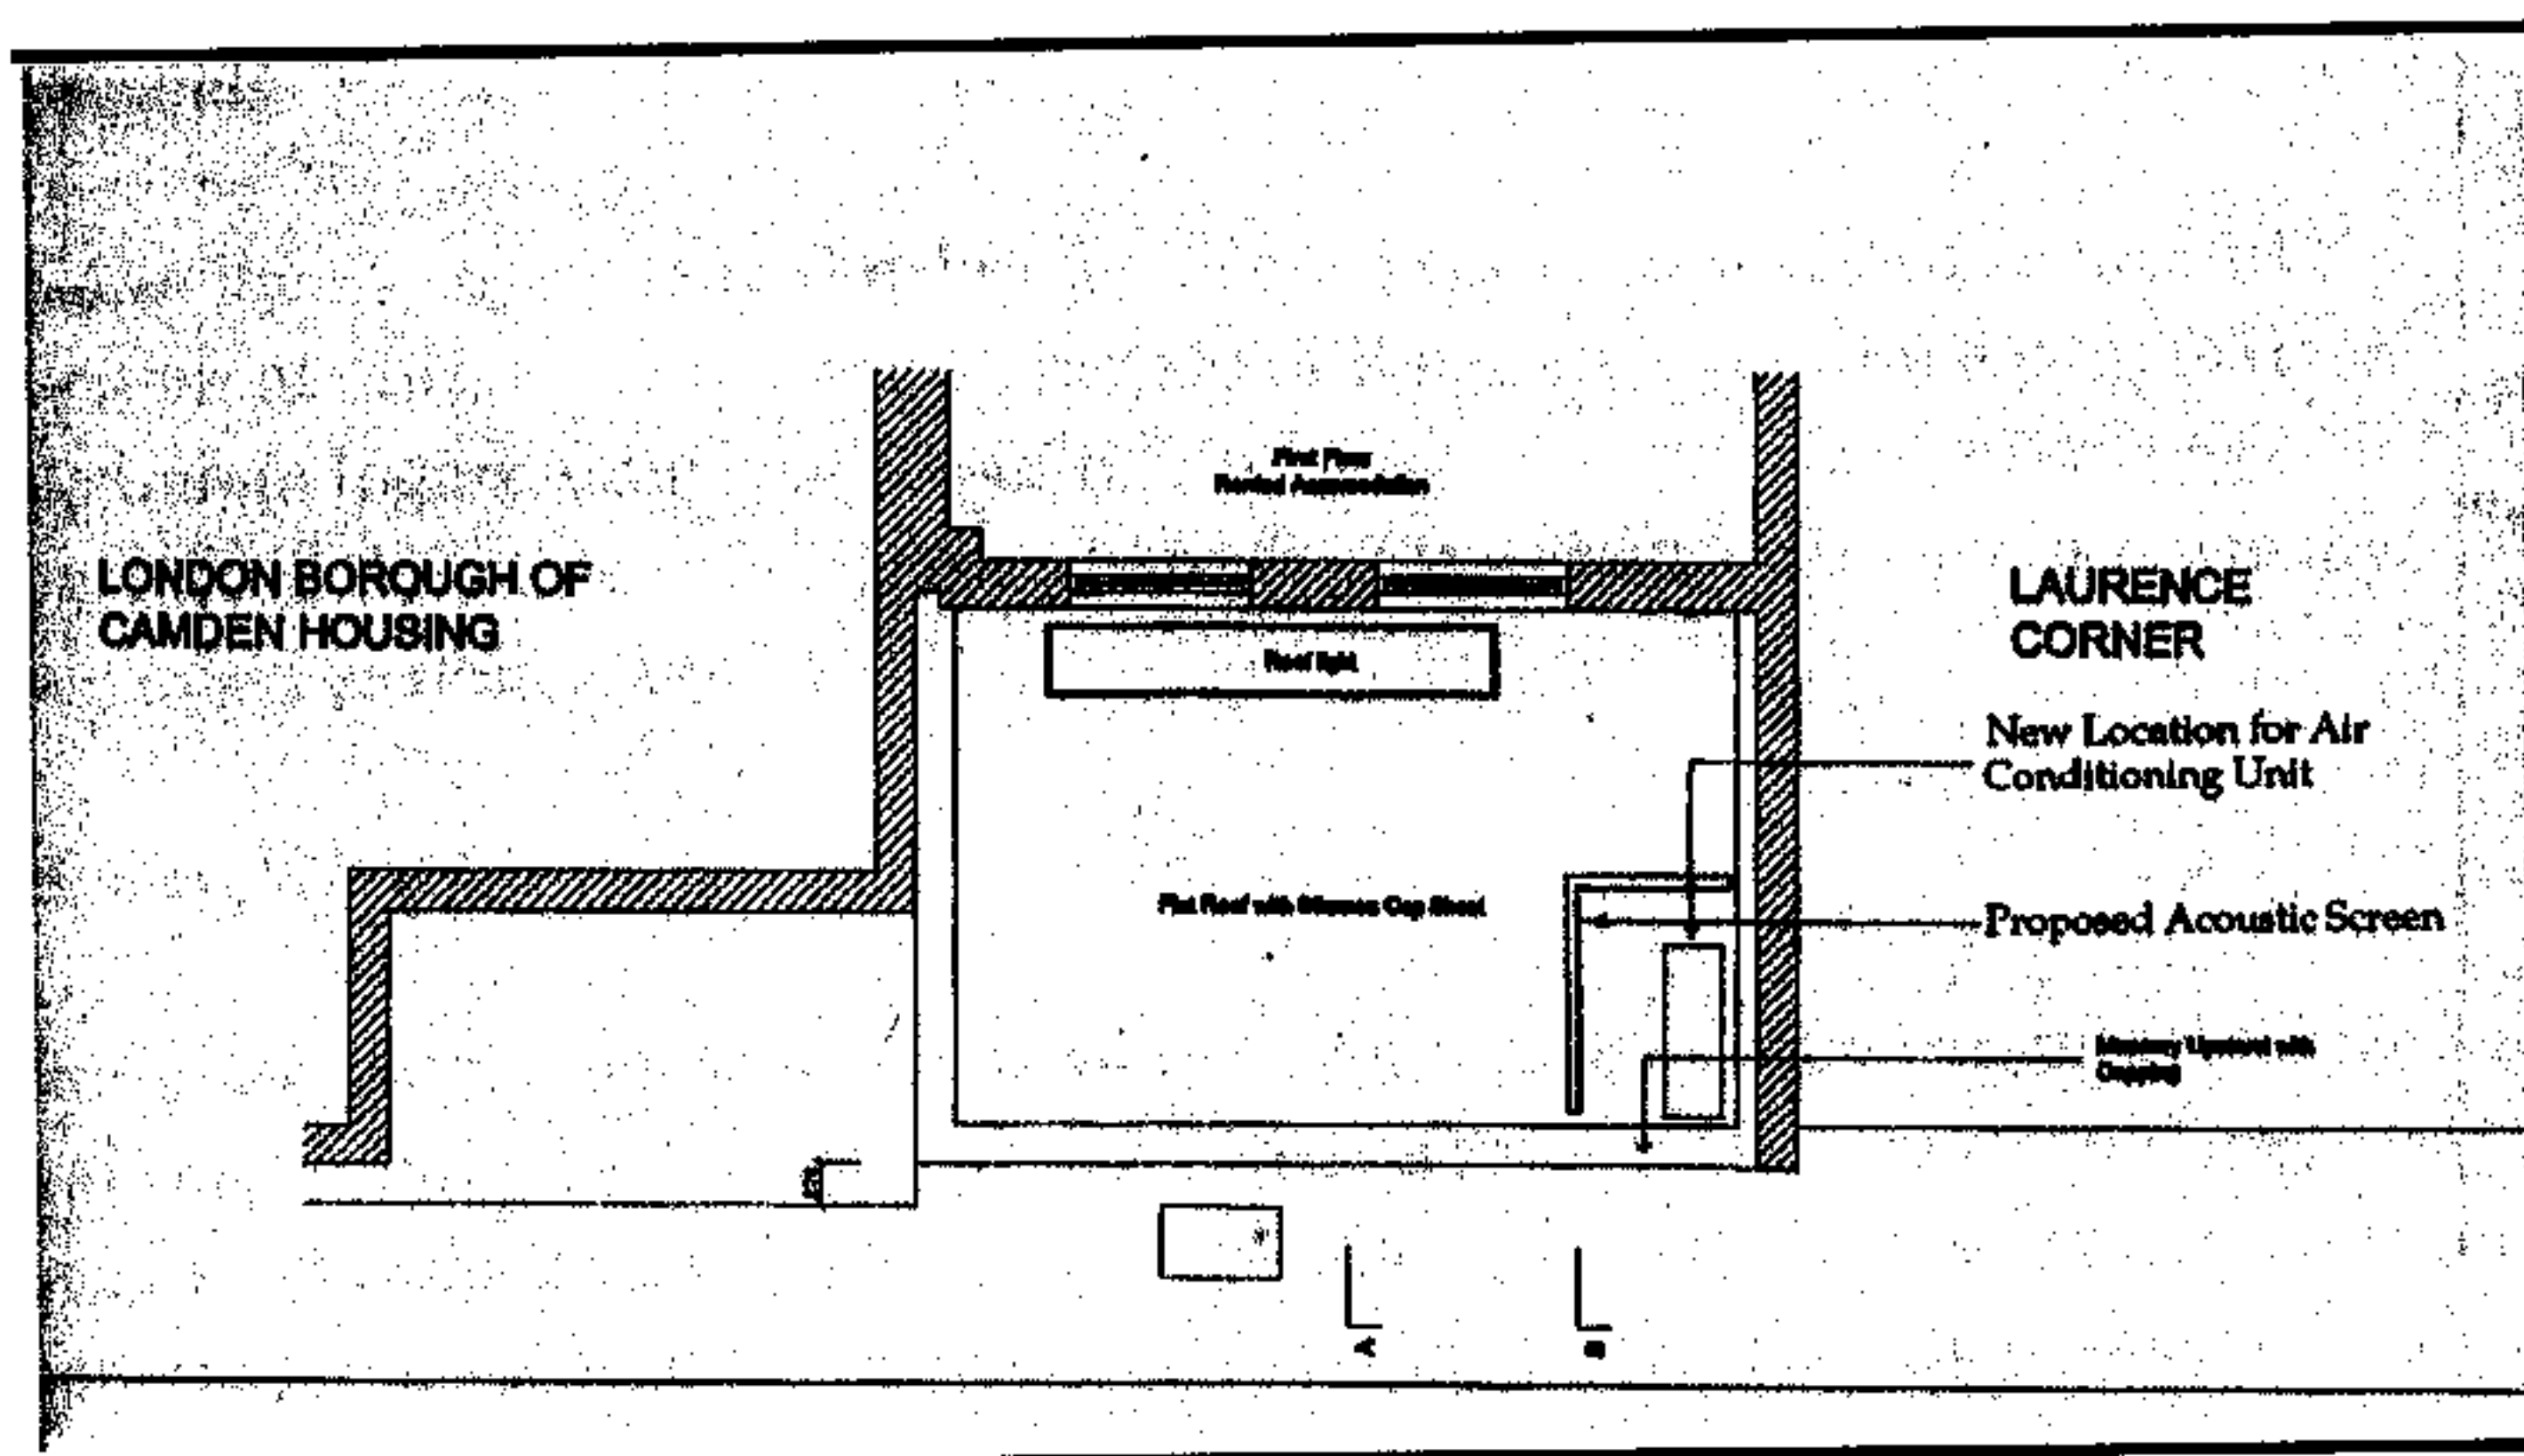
Proposed First Floor Plan Showing New Location of Air-conditioning Unit
